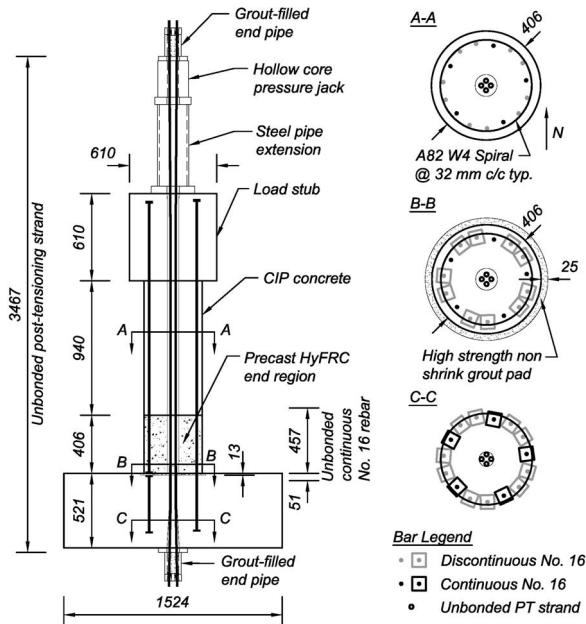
Rocking Post-tensioned HyFRC Column Elevation and Cross Sections
